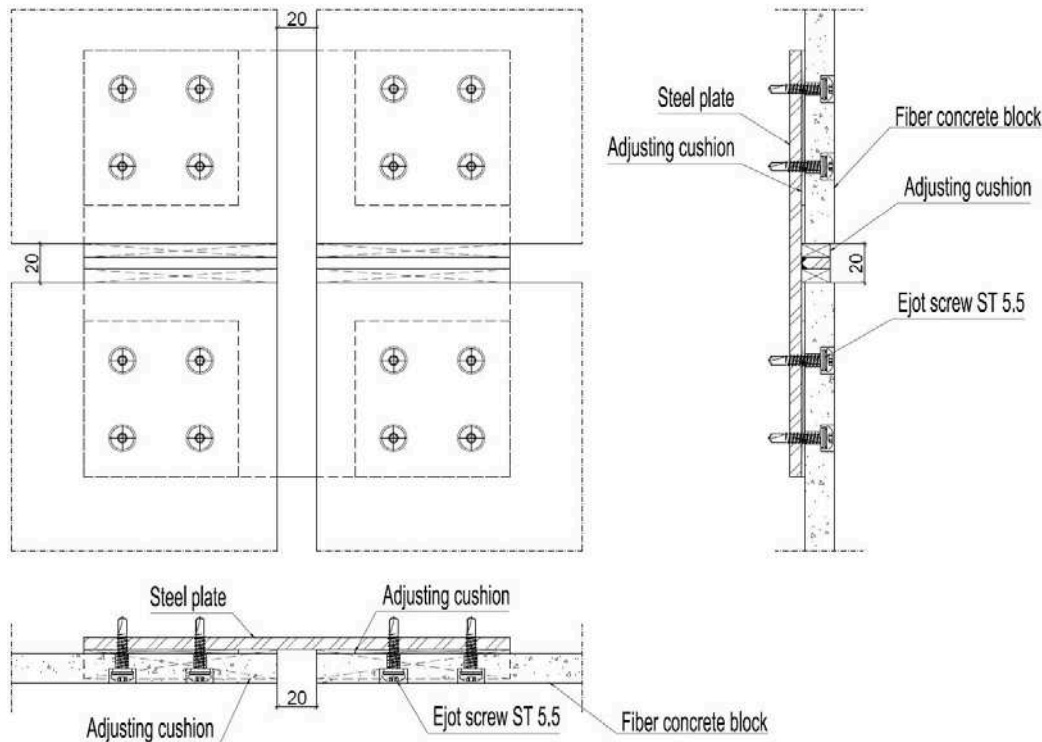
A simple bolted connection with a predrilled hole in the GFRC plate.
